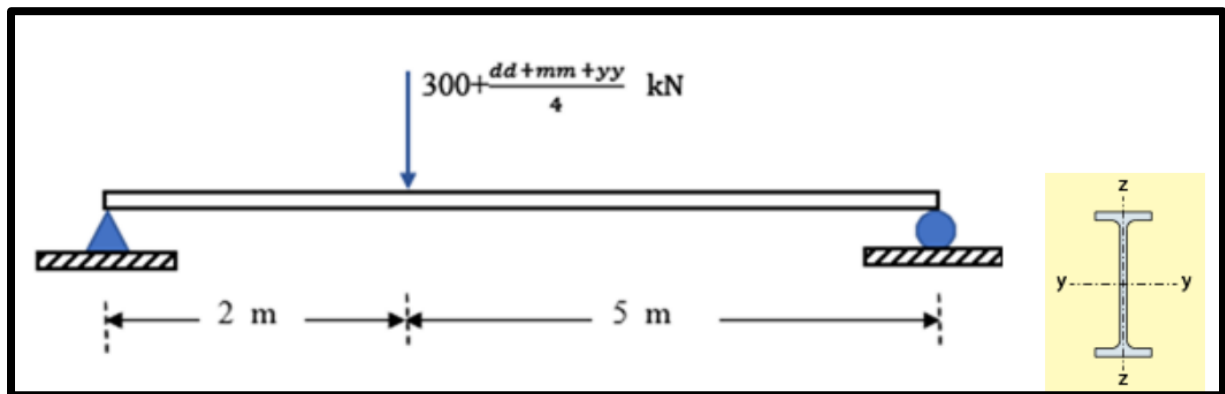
Simply Supported Steel Beam (UB 406 × 140 × 53) Subjected to an Eccentric Point Load for Deflection Analysis
